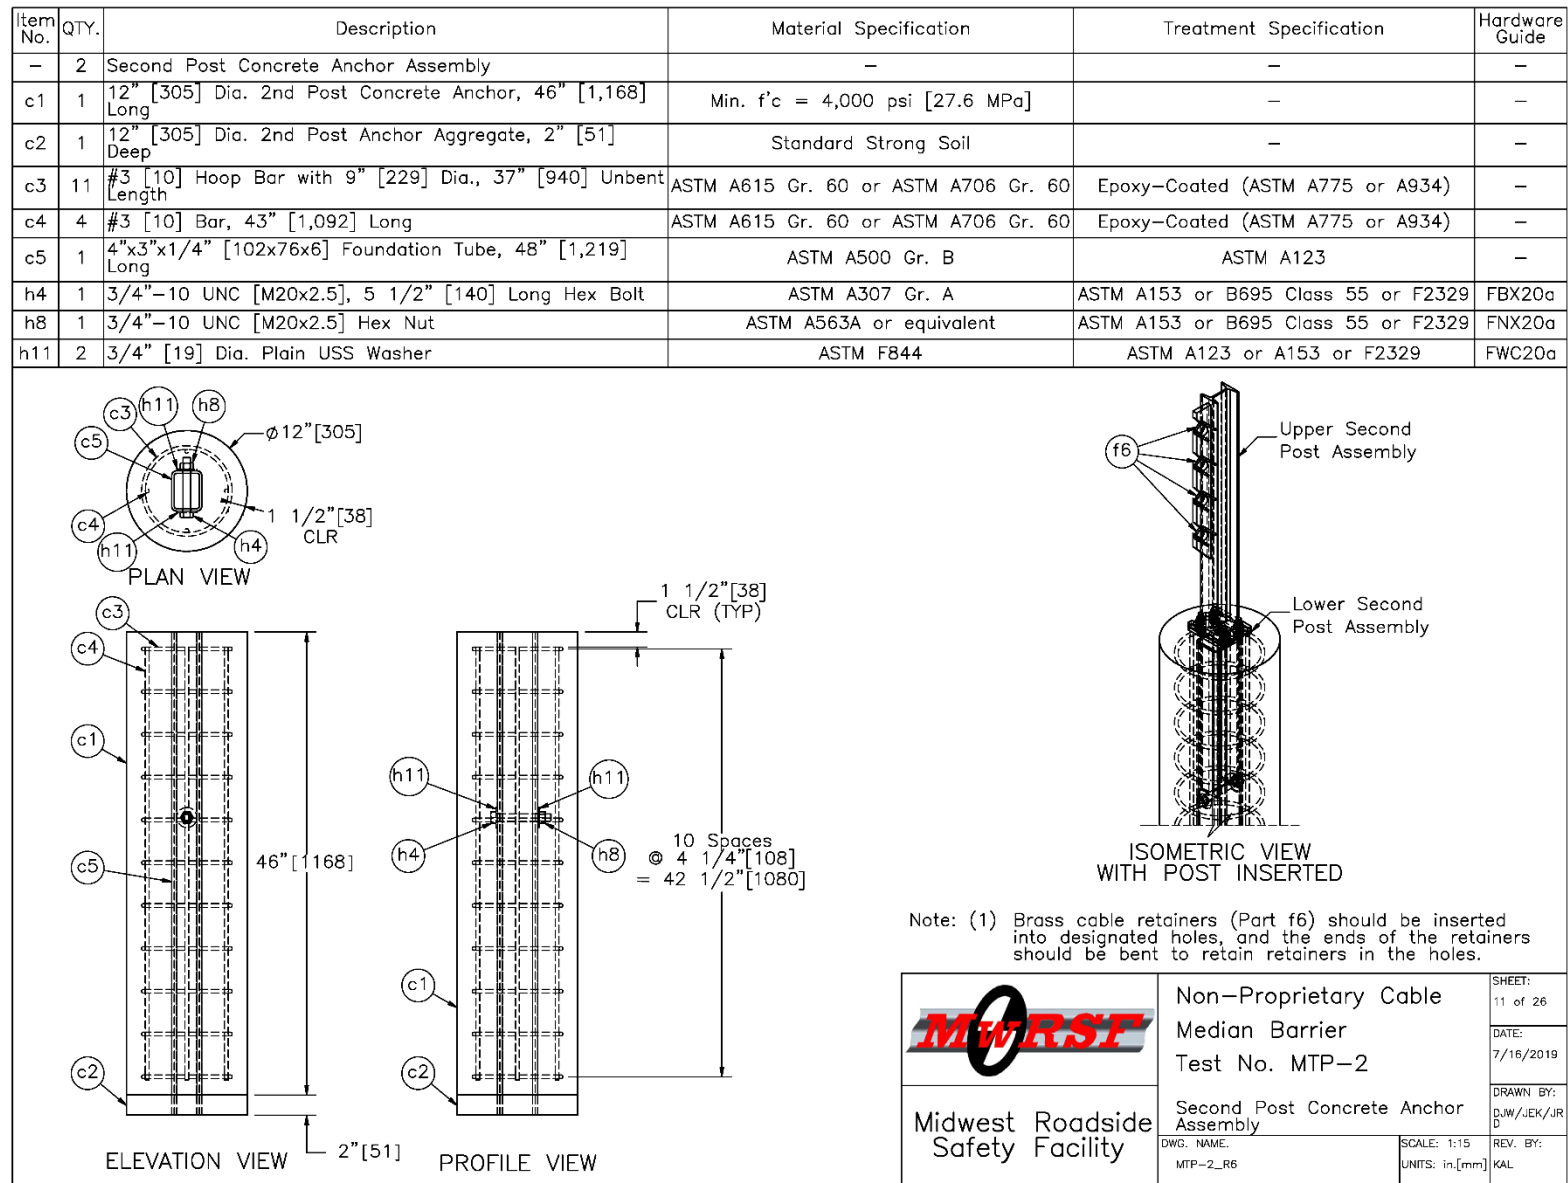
Second Post Concrete Anchor Assembly, Test No. MTP-2
